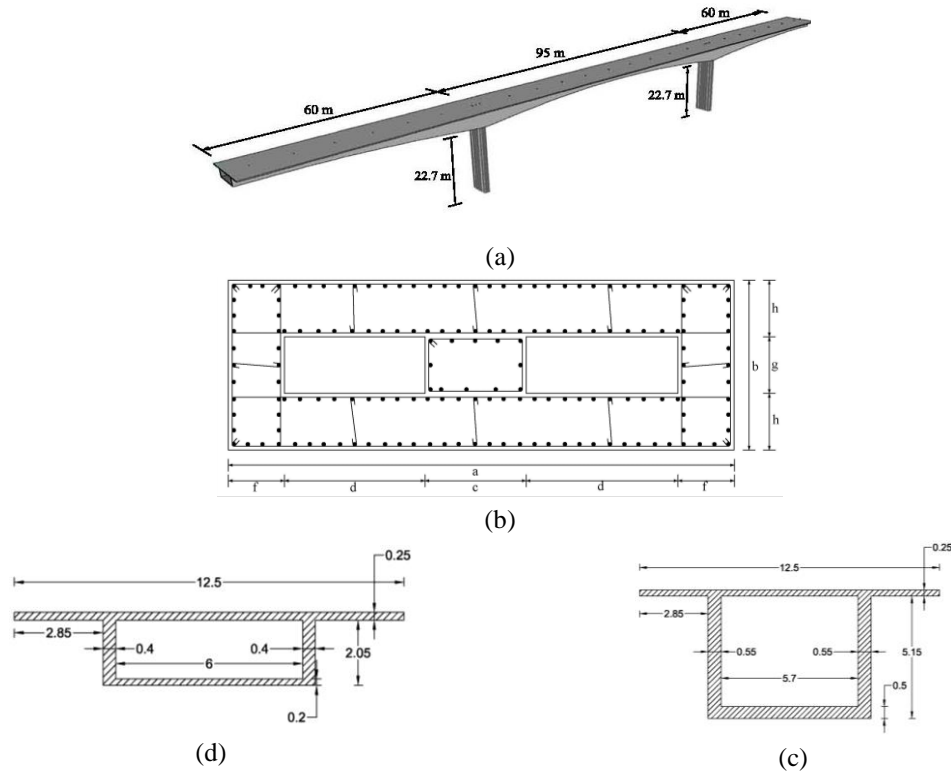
Three-span case study regular bridge (a) general view, (b) piers cross section, (c) deck sections at top of the piers and (d) deck section at span
